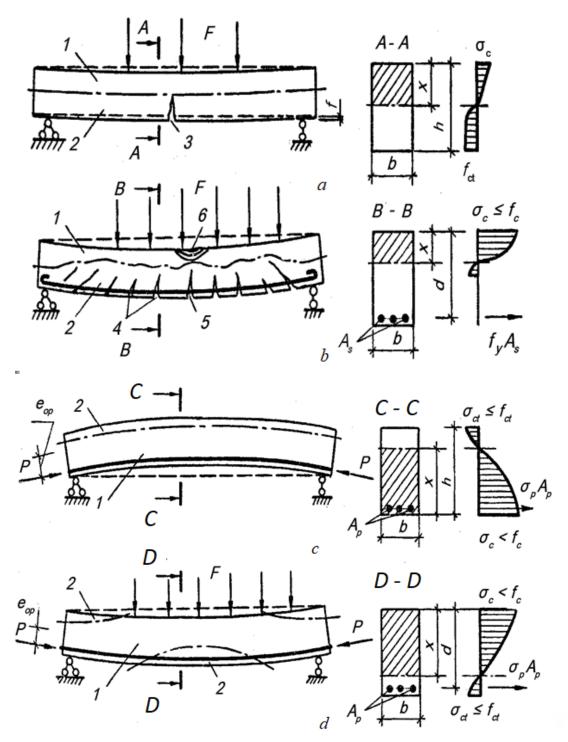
The behavior of the concrete and reinforced concrete beams under the load: a – failure of the concrete beam; b – failure of the reinforced concrete beam; c – stress-strain state of the pre-stressed beam at the stage of manufacture; d – the same in the operation phase; 1 – the compressed zone; 2 – the tensile zone; 3 – the crack, which causes failure of the beam; 4 – cracks in tensile concrete; 5 – the yielding zone of the reinforcement; 6 – the concrete crushing
